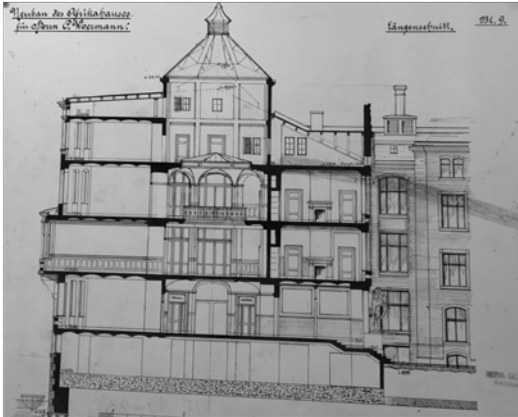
Section drawing of the building hanging in the stairwell inside Afrikahaus. (Source: Author 2022)
